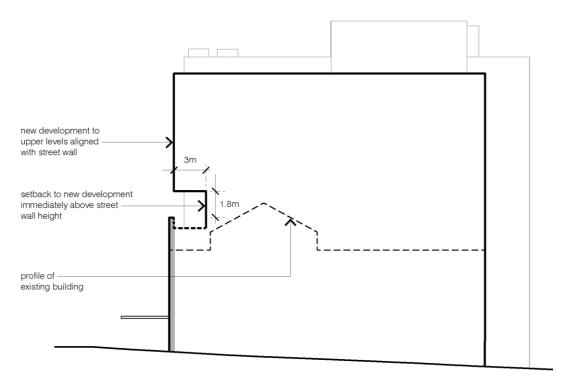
First level setback requirement for 18-20 Darlinghurst Road
